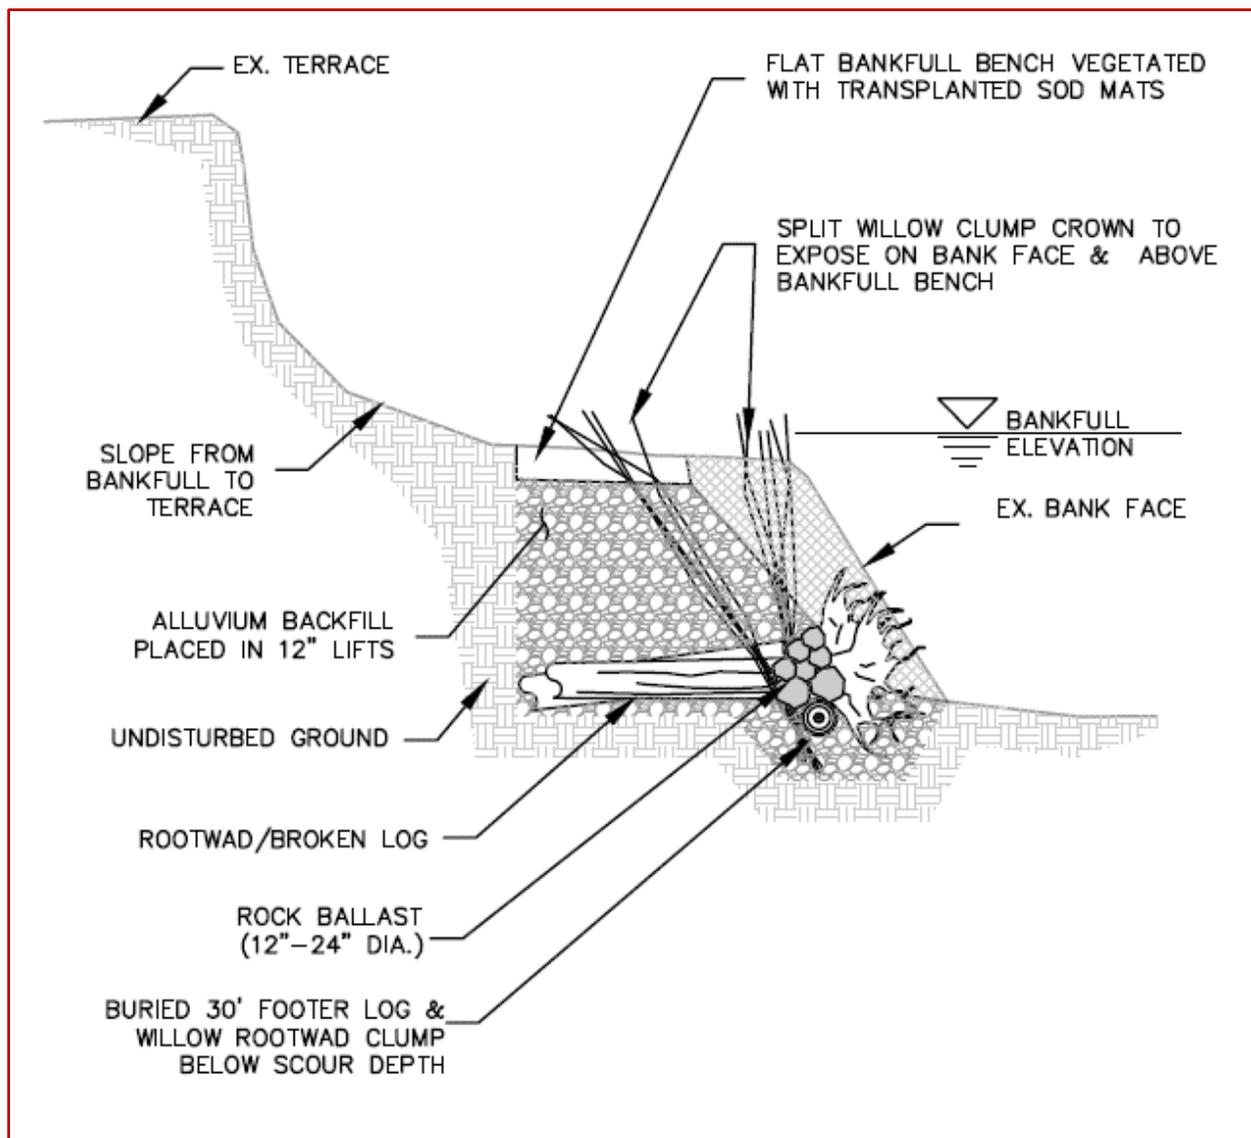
Profile view of typical wood revetment bank stabilization treatment.
